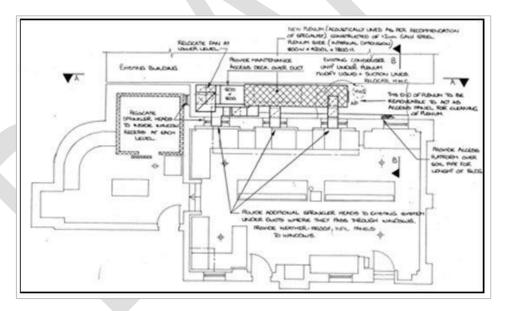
The plan of the kitchen located in the basement of the northern 1920s wing showing the exhaust equipment. (Source: SHFA File RE 1352.01.01)
